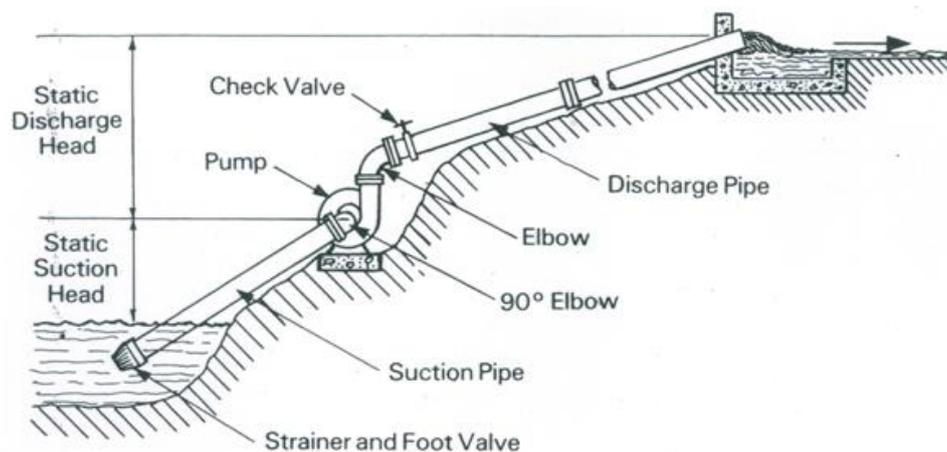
Suction installation of a centrifugal pump. (Source: FAO, 1986)
